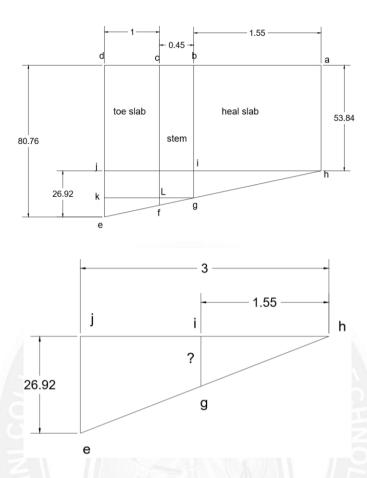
Cantilever retaining wall (Heal slab Top view)
